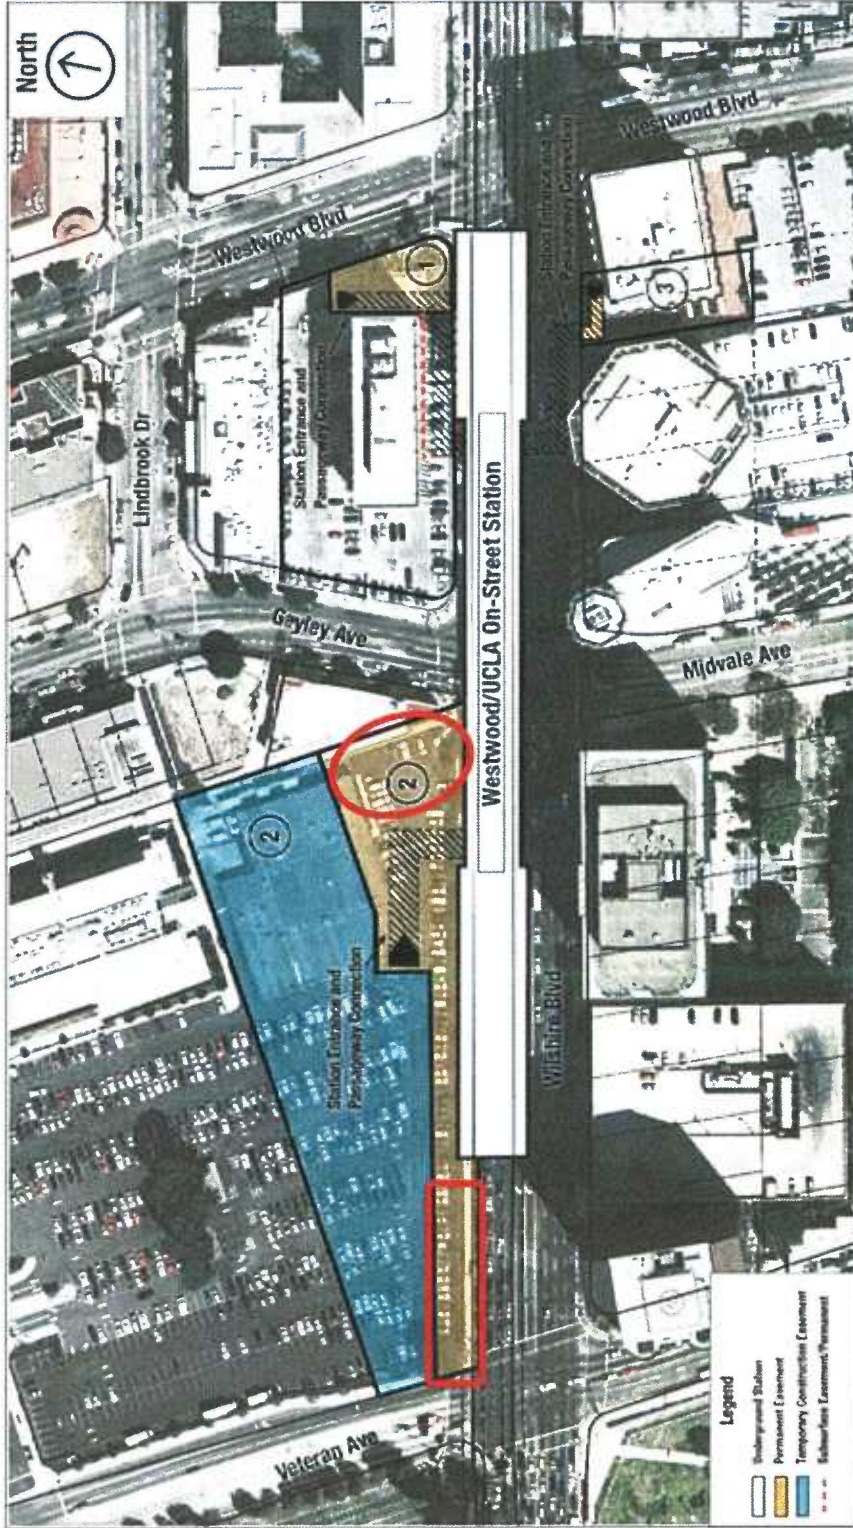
Westwood/UCLA On-Street Station Split North-South Station Entrance Option
